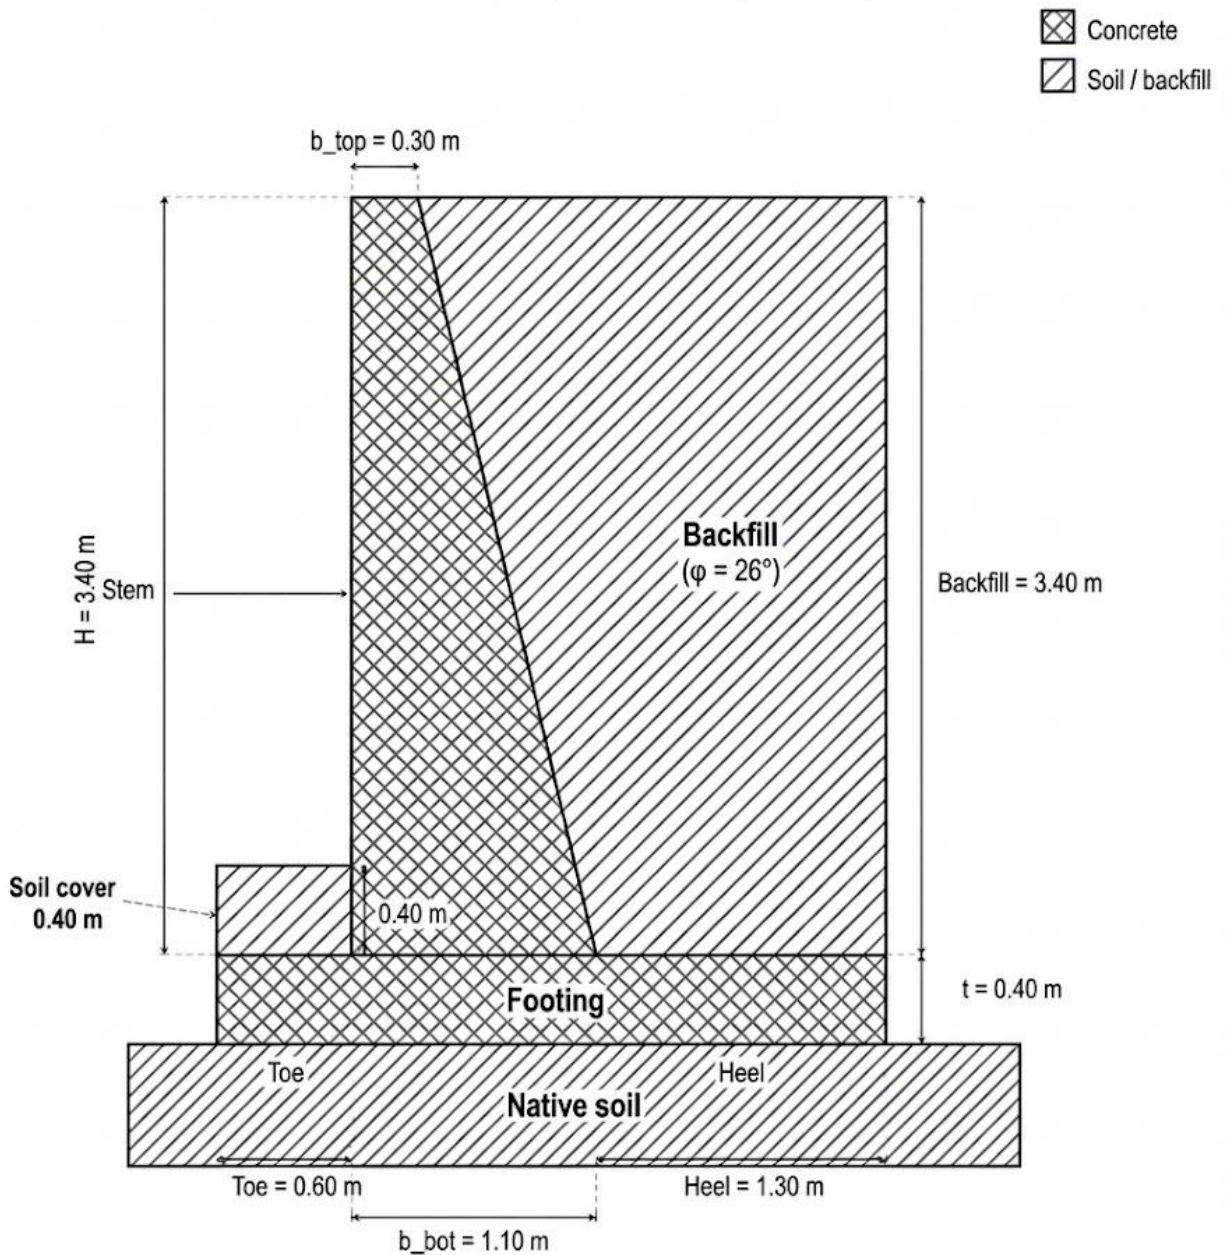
Cross section of gravity retaining wall geometry for optimized soil replacement.
